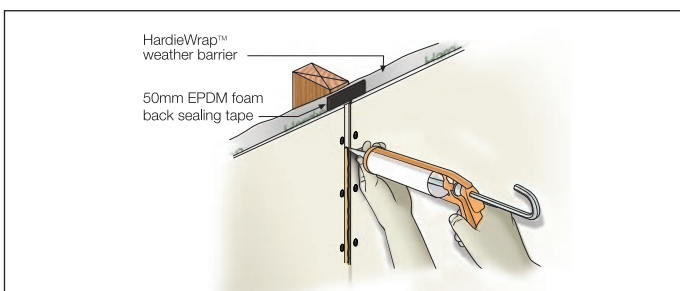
APPLY SEALANT TO JOINT GROOVE
